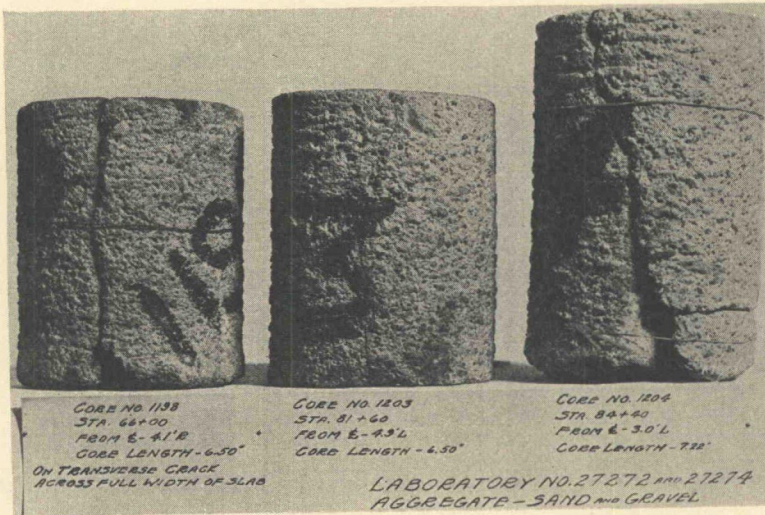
Cores from Cracked Sand-Gravel Pavement
